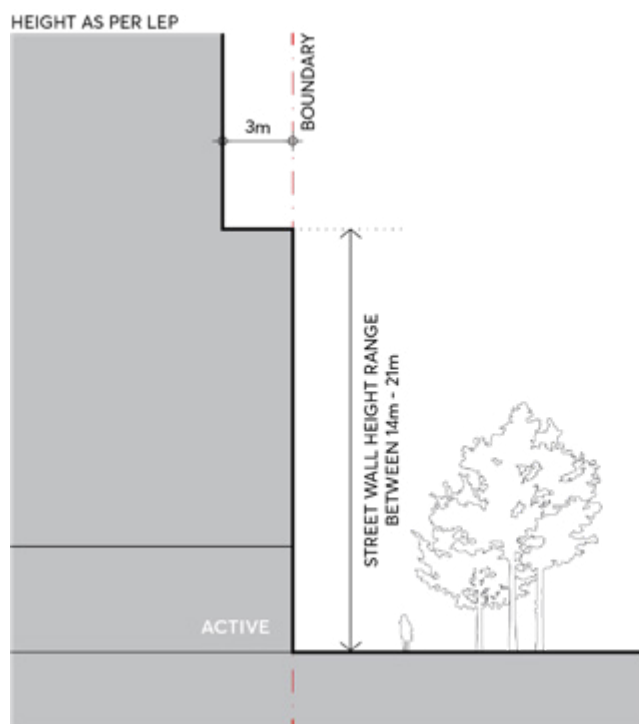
New Civic Space or Park Edge (Section G) Setbacks and Street Wall Height
